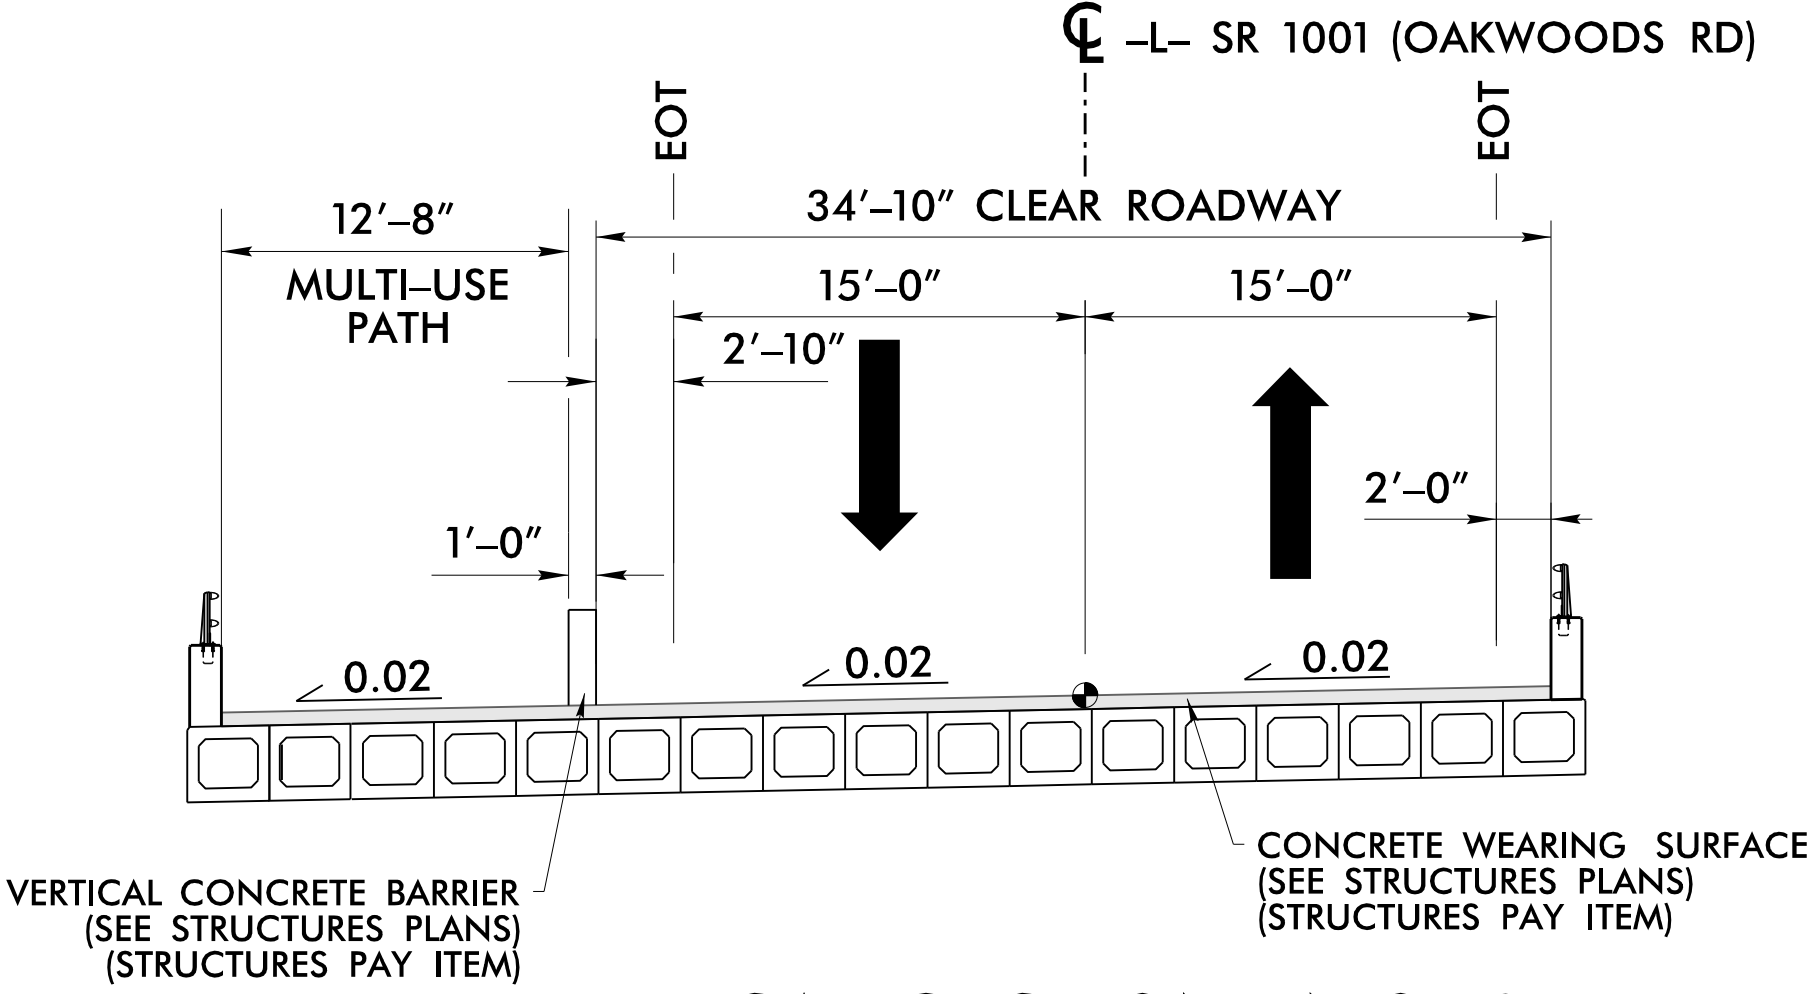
DETAIL OF HANDRAIL & GUARDRAIL PLACEMENT
